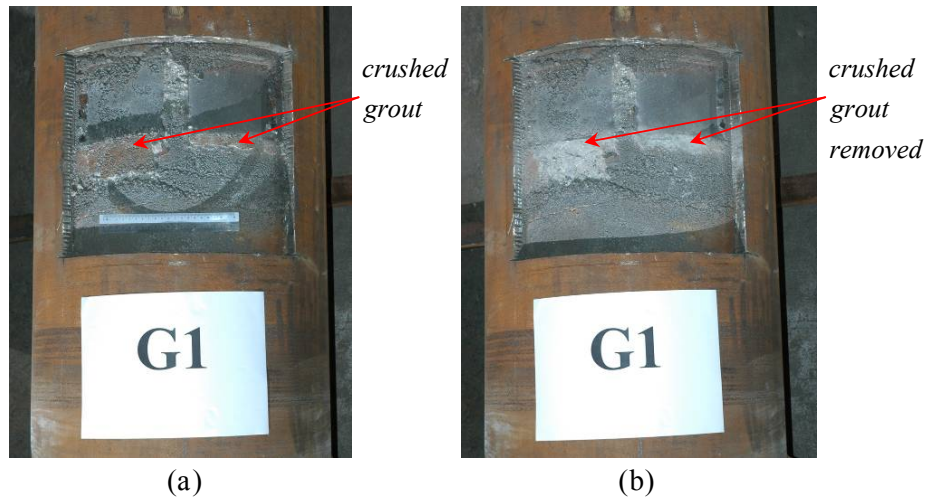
Opening up of G1 after tests: (a) with loose damaged grout in original position; (b) with loose damaged grout removed
